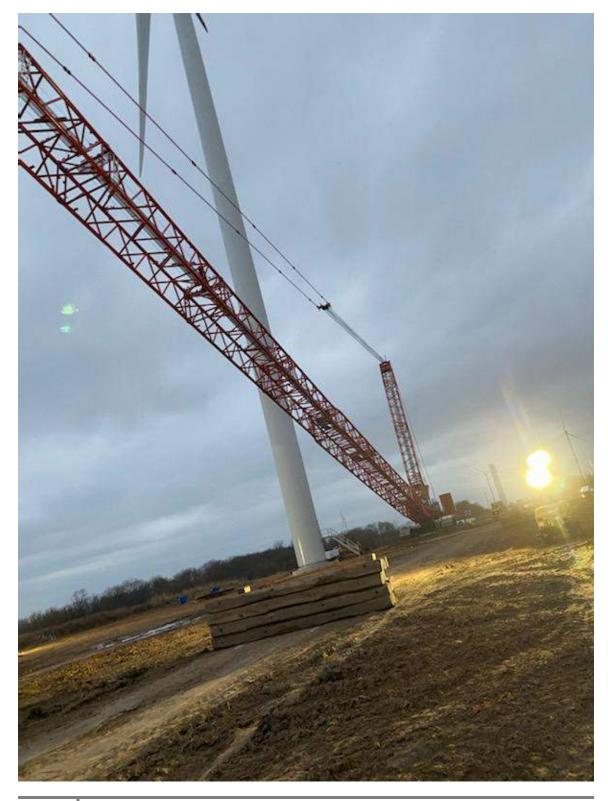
MAIN ERECTION - TOWER SECTIONS
